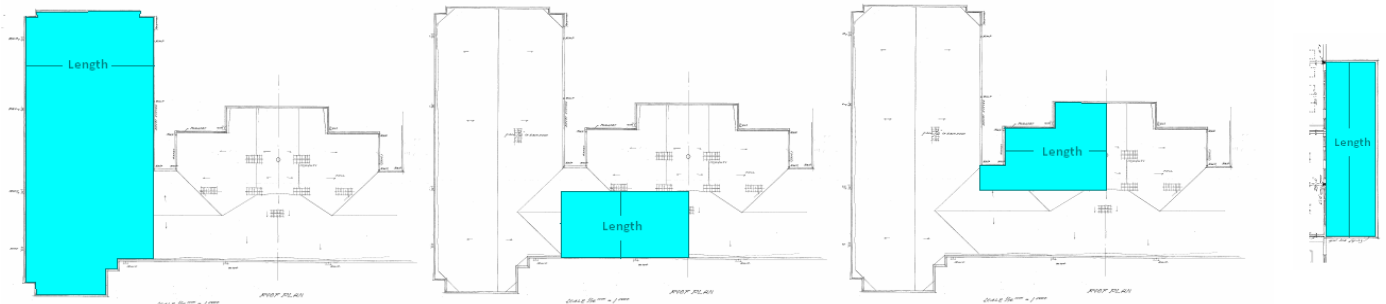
Four separate roof area in which their upper portion was modeled as wall sections
